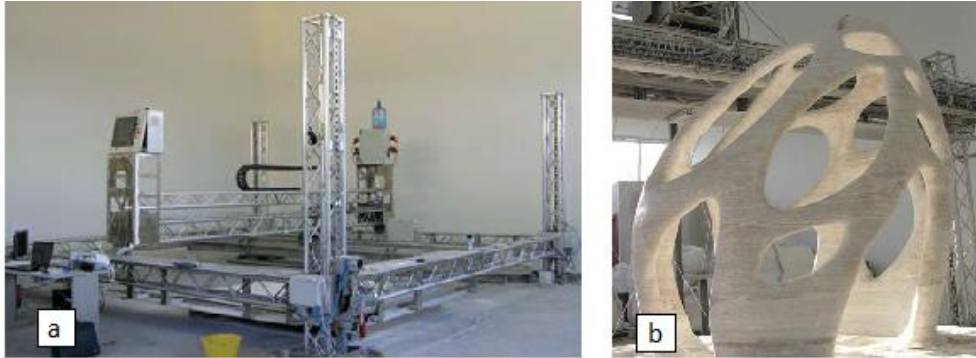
(a) D-shape printer (b) Final printed component with all the excess raw material removed [15]
